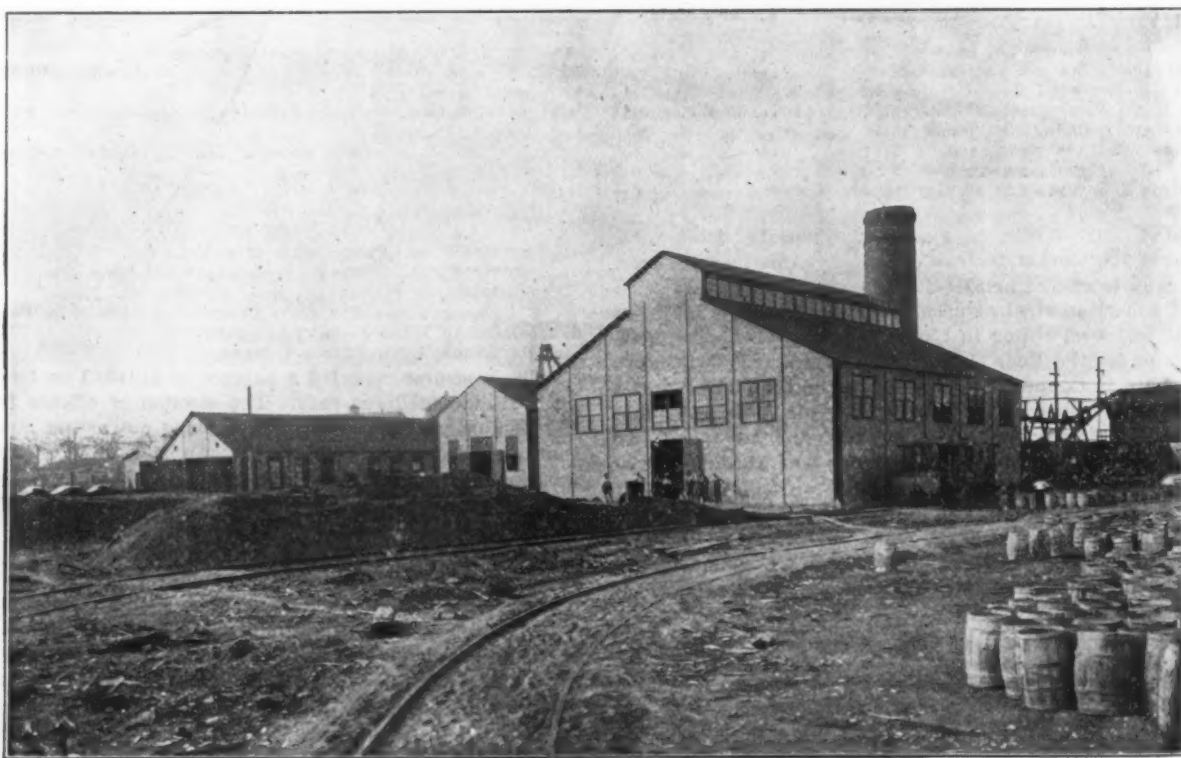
Phoenix Hollow Tile Construction.—Barber Asphalt Plant, Maurer, N. J.
